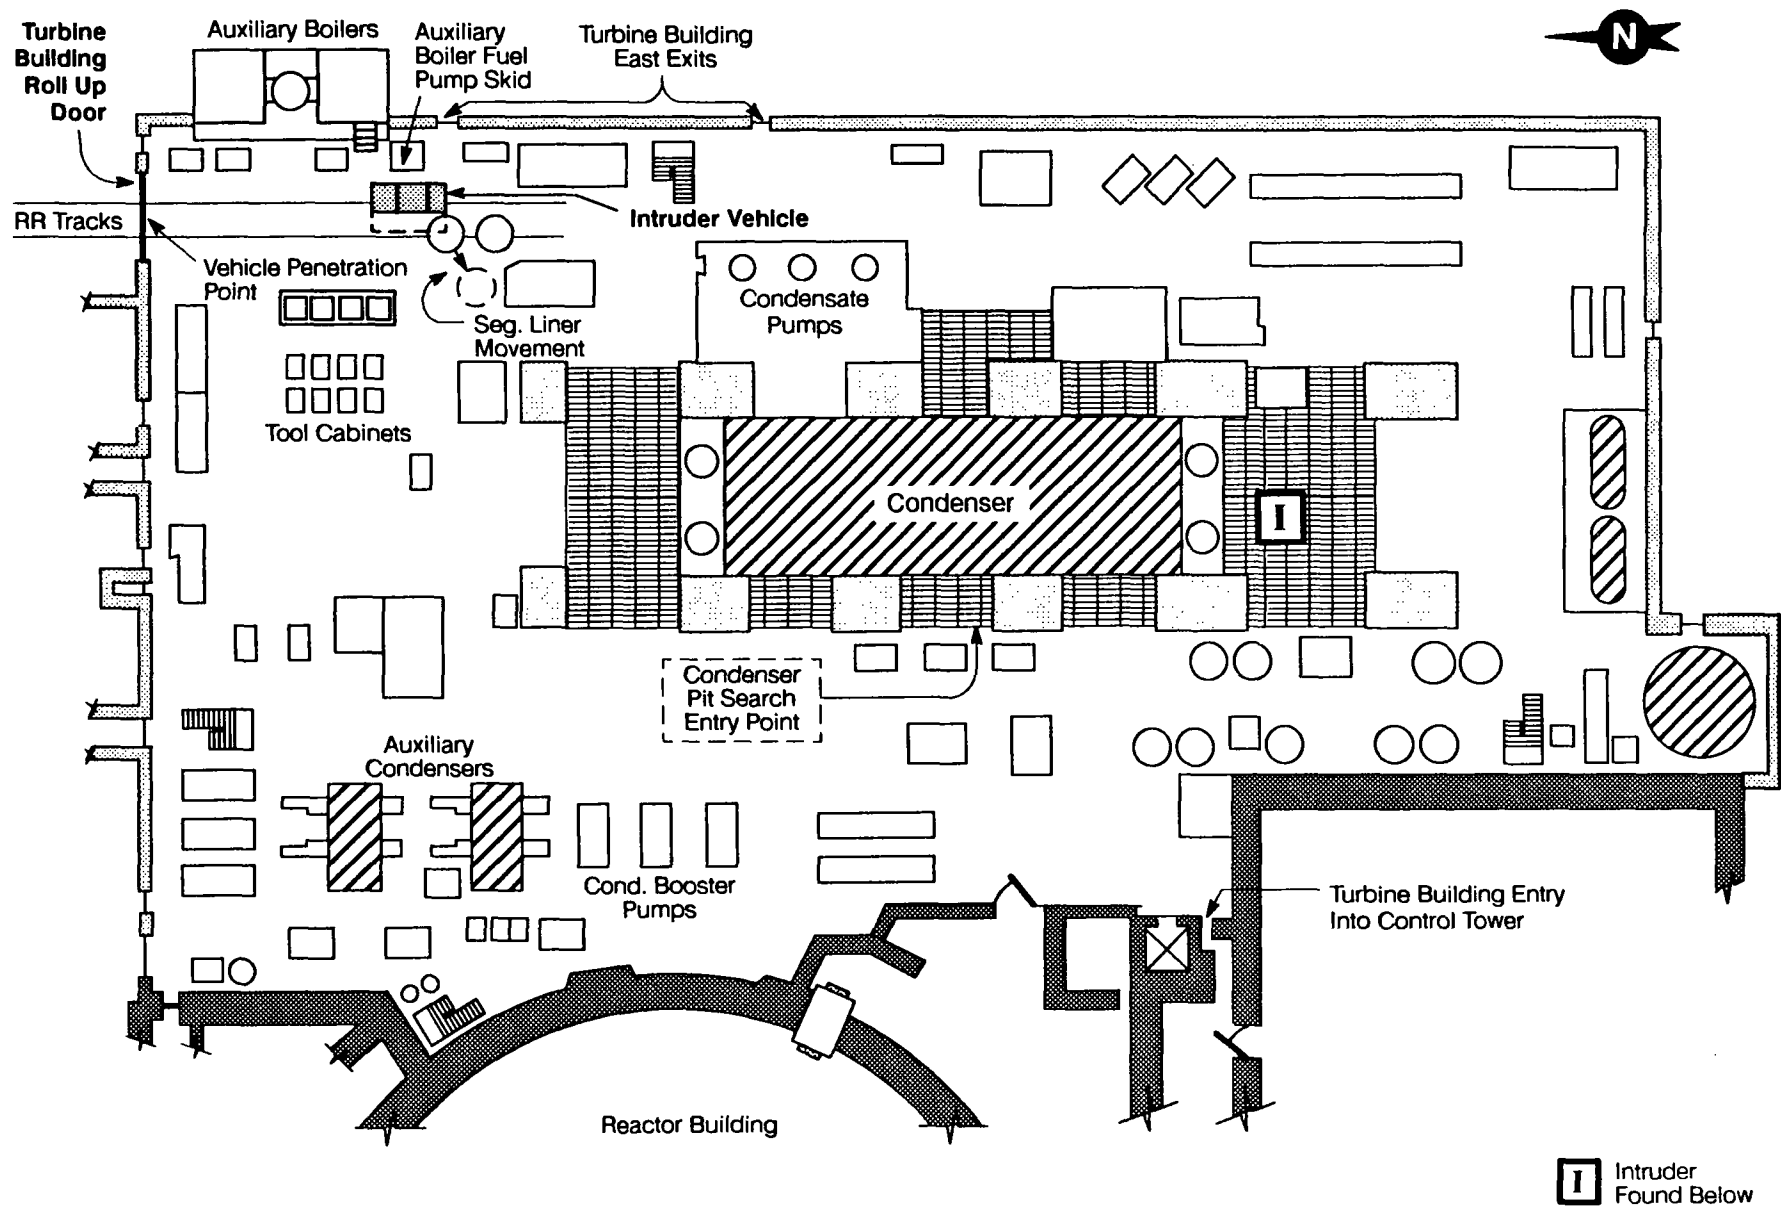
TMI Turbine Building [Elevation 305 feet (93m)]
